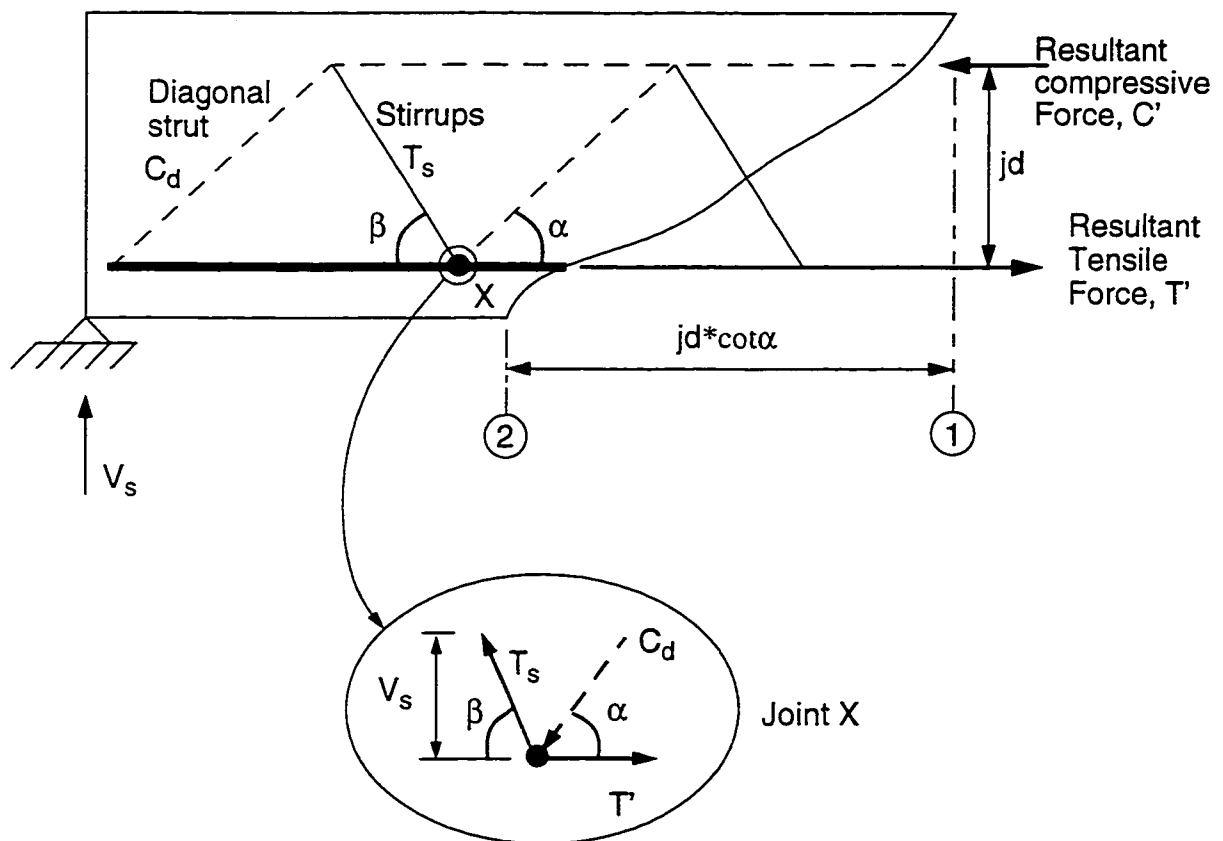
Shear Failure Mechanism in a Beam With Web Reinforcement
